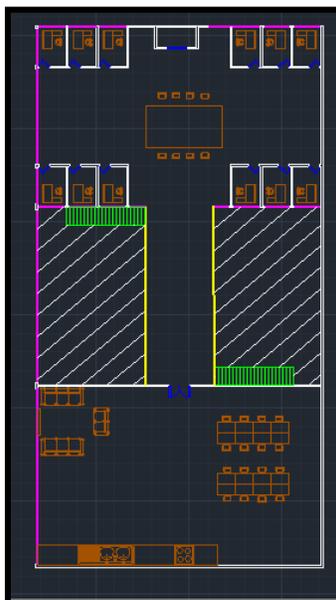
Second floor of building, including office spaces, elevator and kitchenette.
